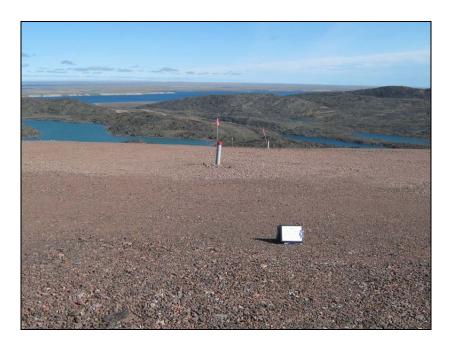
Panoramic photo facing southeast towards west slope of Upper Site Landfill. ↑
